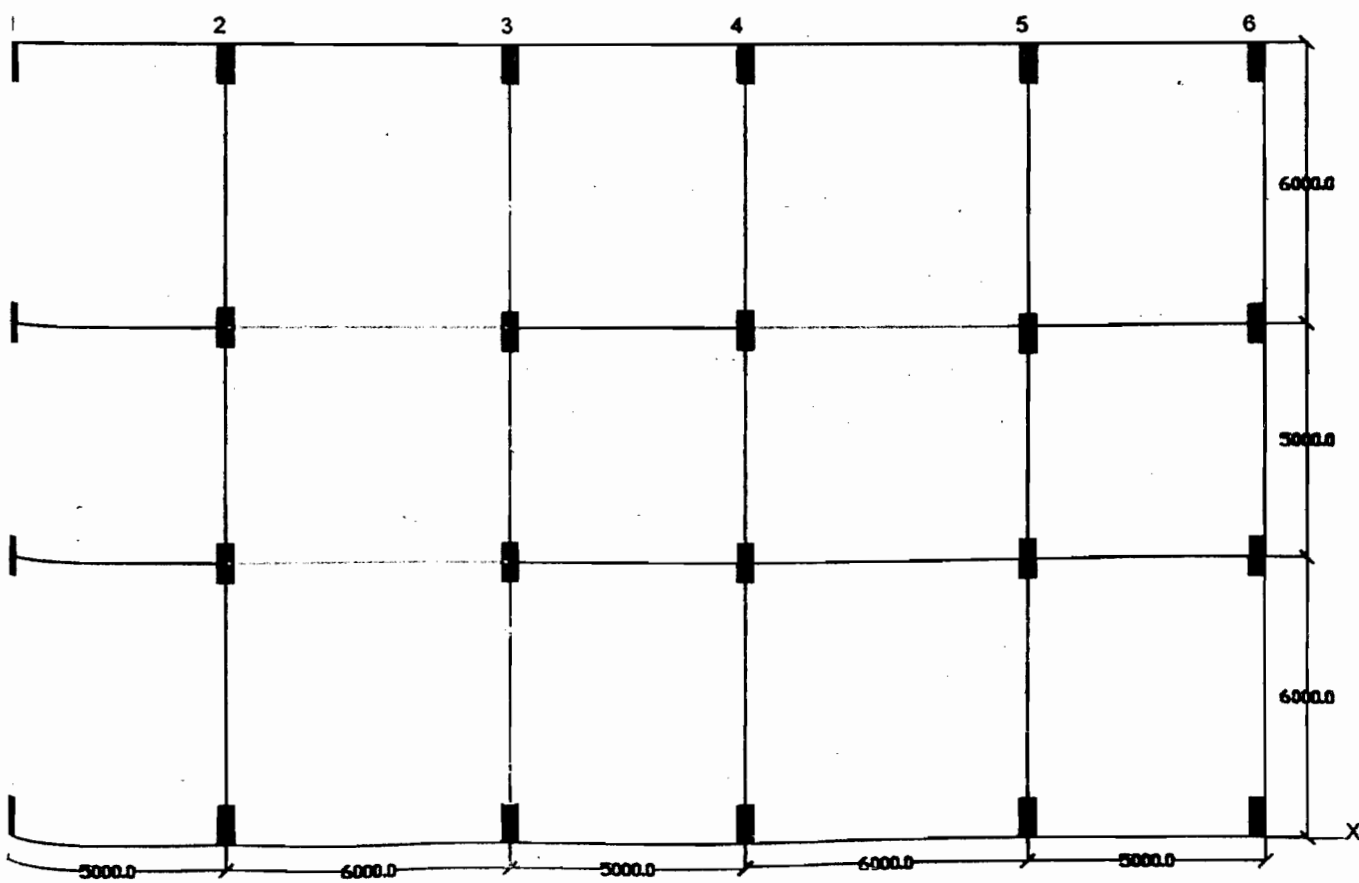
(b) TYPICAL FLOOR PLAN OF SYMMETRICAL MULTI STOREYED BUILDING OF EXAMPLE 1 (CASE 2)
